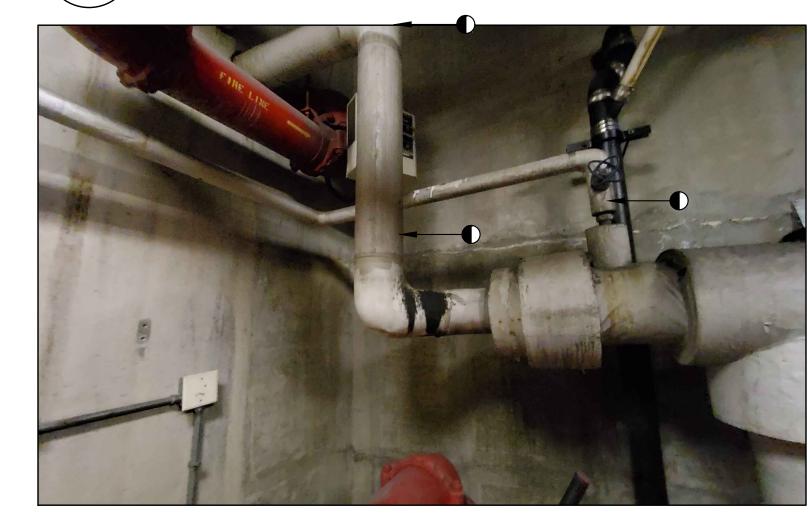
E AREA OF WORK Scale: NONE
